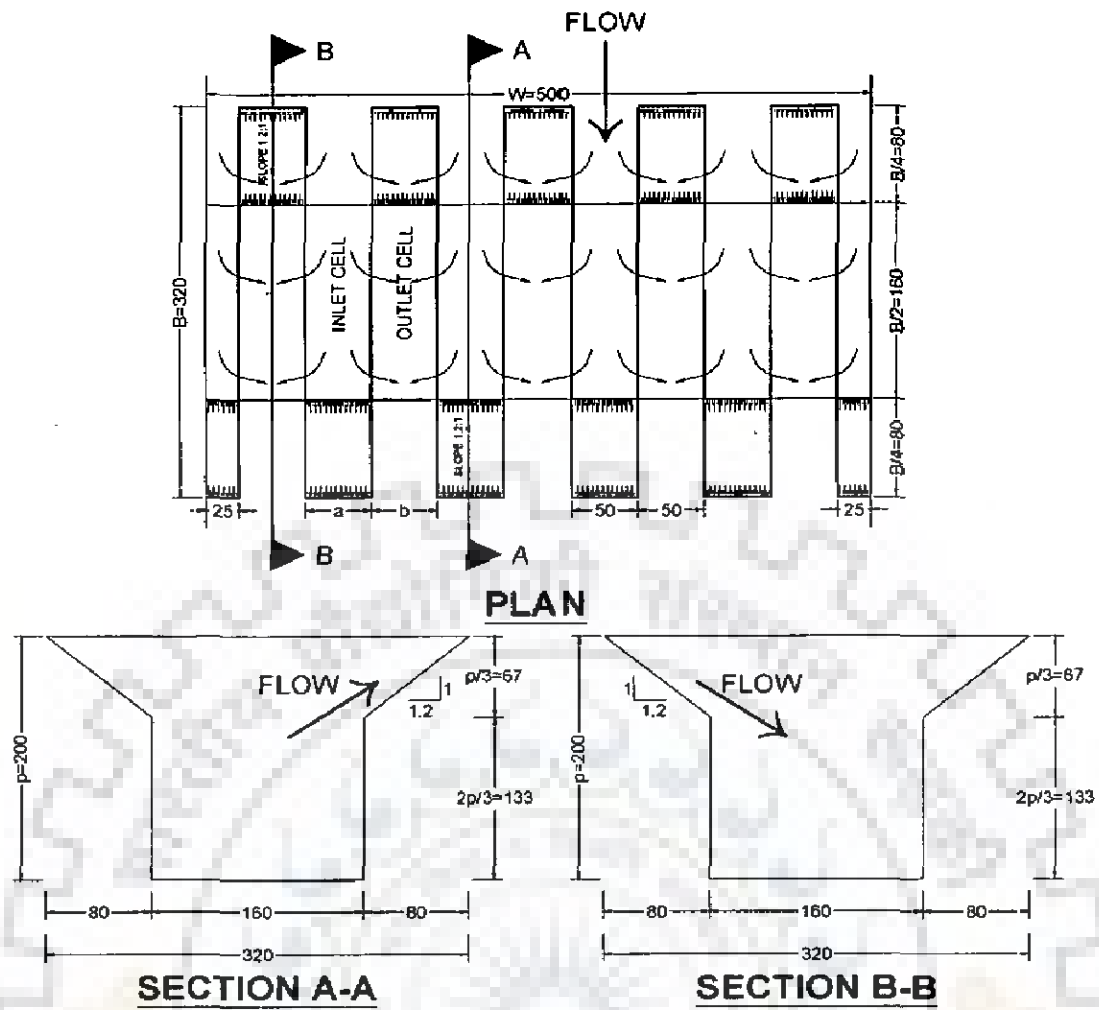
Plan and section of model  $P_1M_3$  (dimensions in mm)
